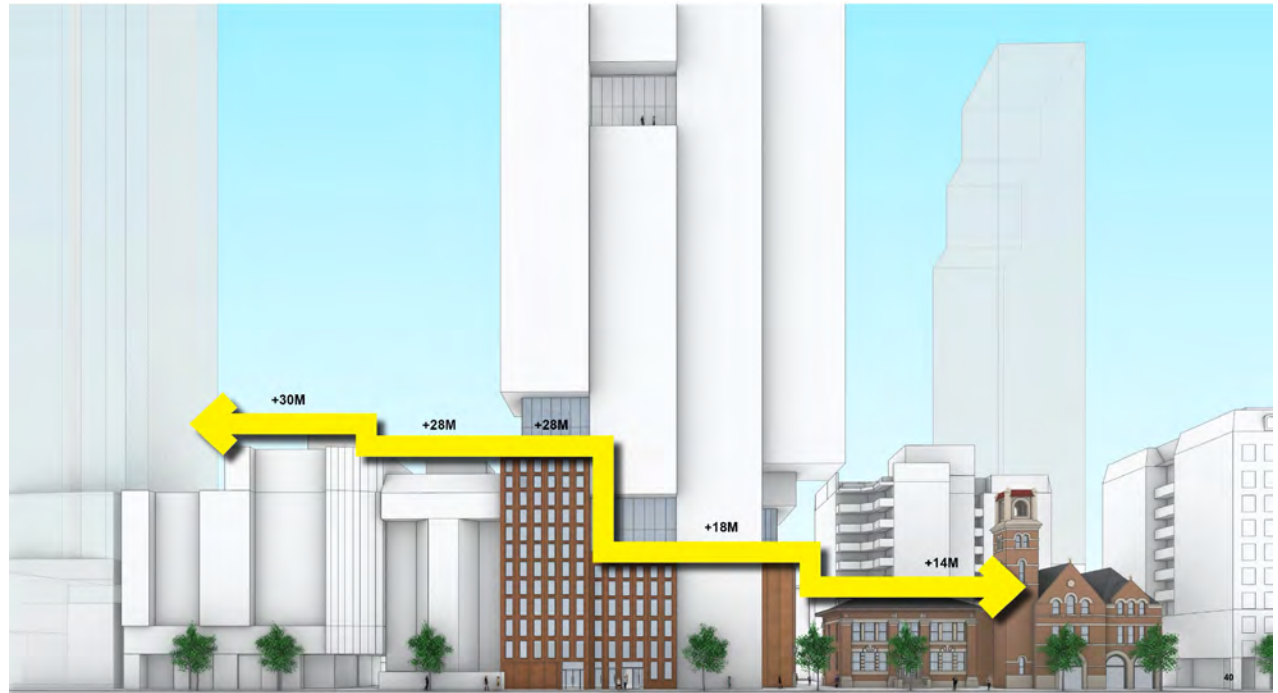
Elevation looking north showing the base-building height strategy (credit: OMA)
